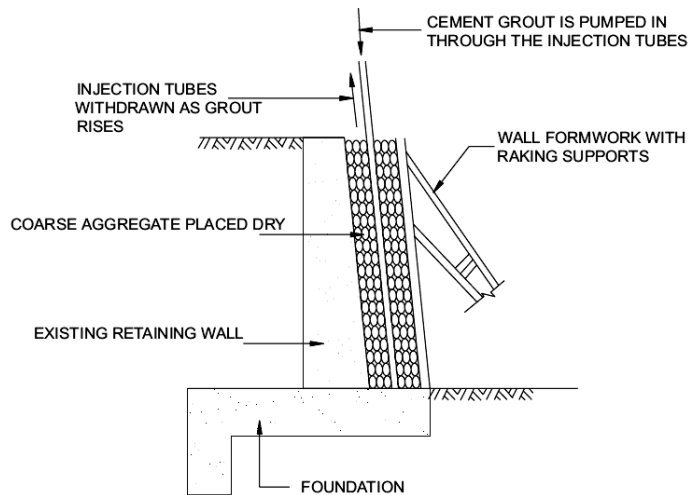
(a): Pre-Placed Aggregate Concrete Repair to Concrete Wall
